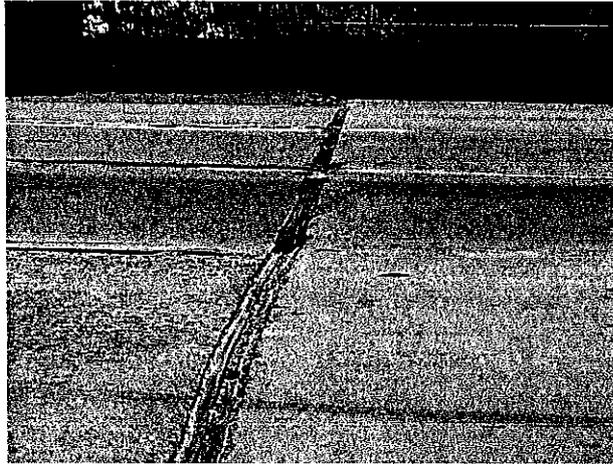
Bridge 29-0174L/R deck joint (non-suspect)
